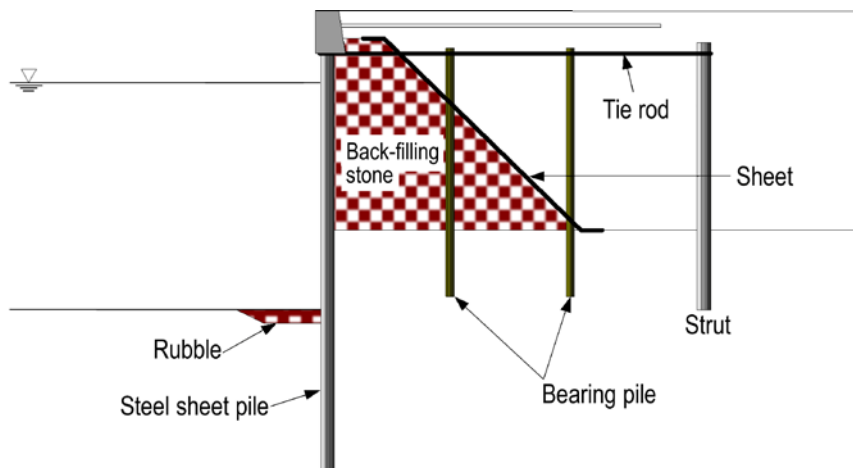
Typical Structure of Steel Sheet Pile-type Mooring Quay
